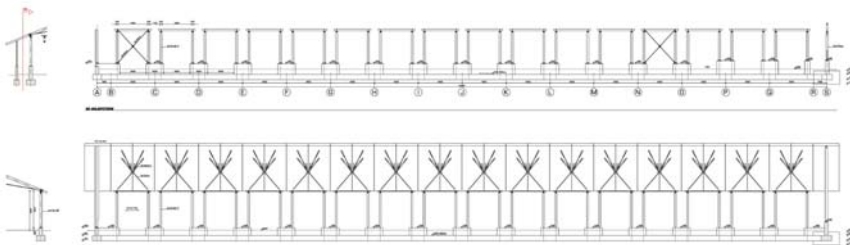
Cross-braced columns supporting the eastern edge of the roof and plate stabilised columns of the western eaves.
